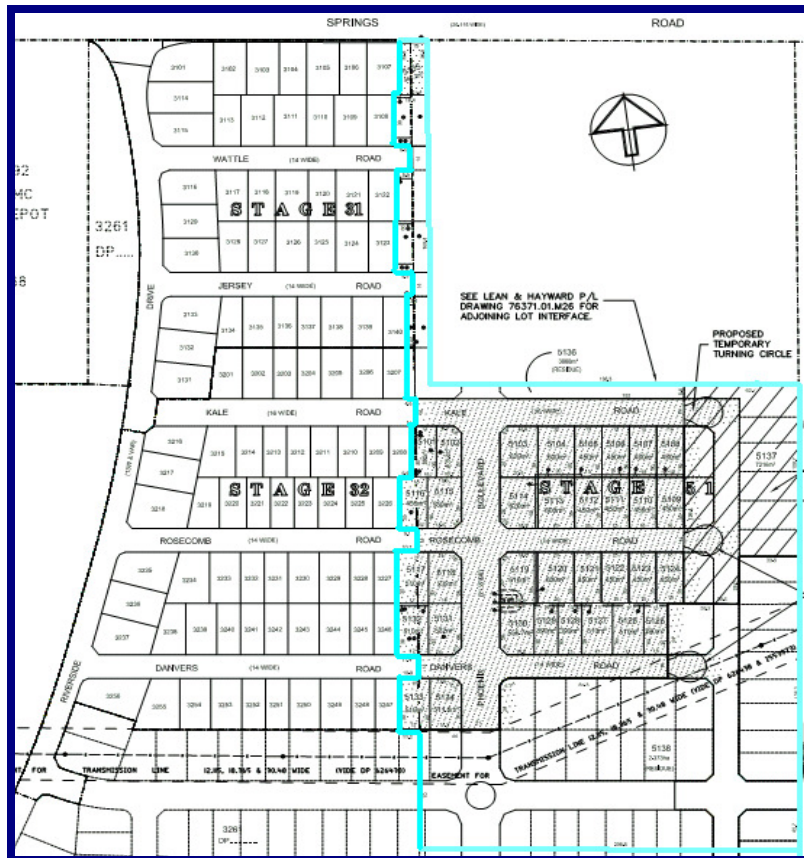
Plan of Proposed Subdivision (see additional plan in Attachment 2)
